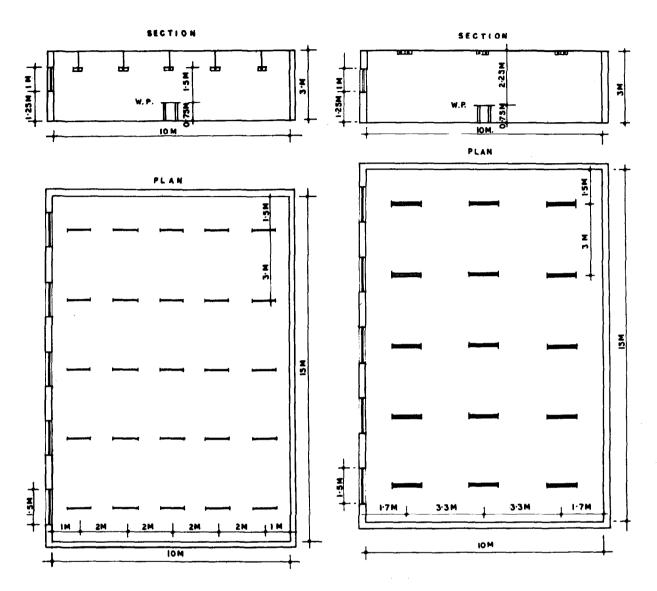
Distribution of Single Lamp Luminaires on Section and Plan (Example 27)
